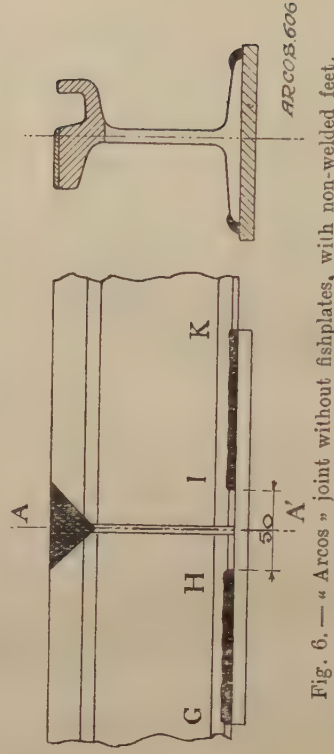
"Arcos" joint without fishplates, with non-welded feet.
